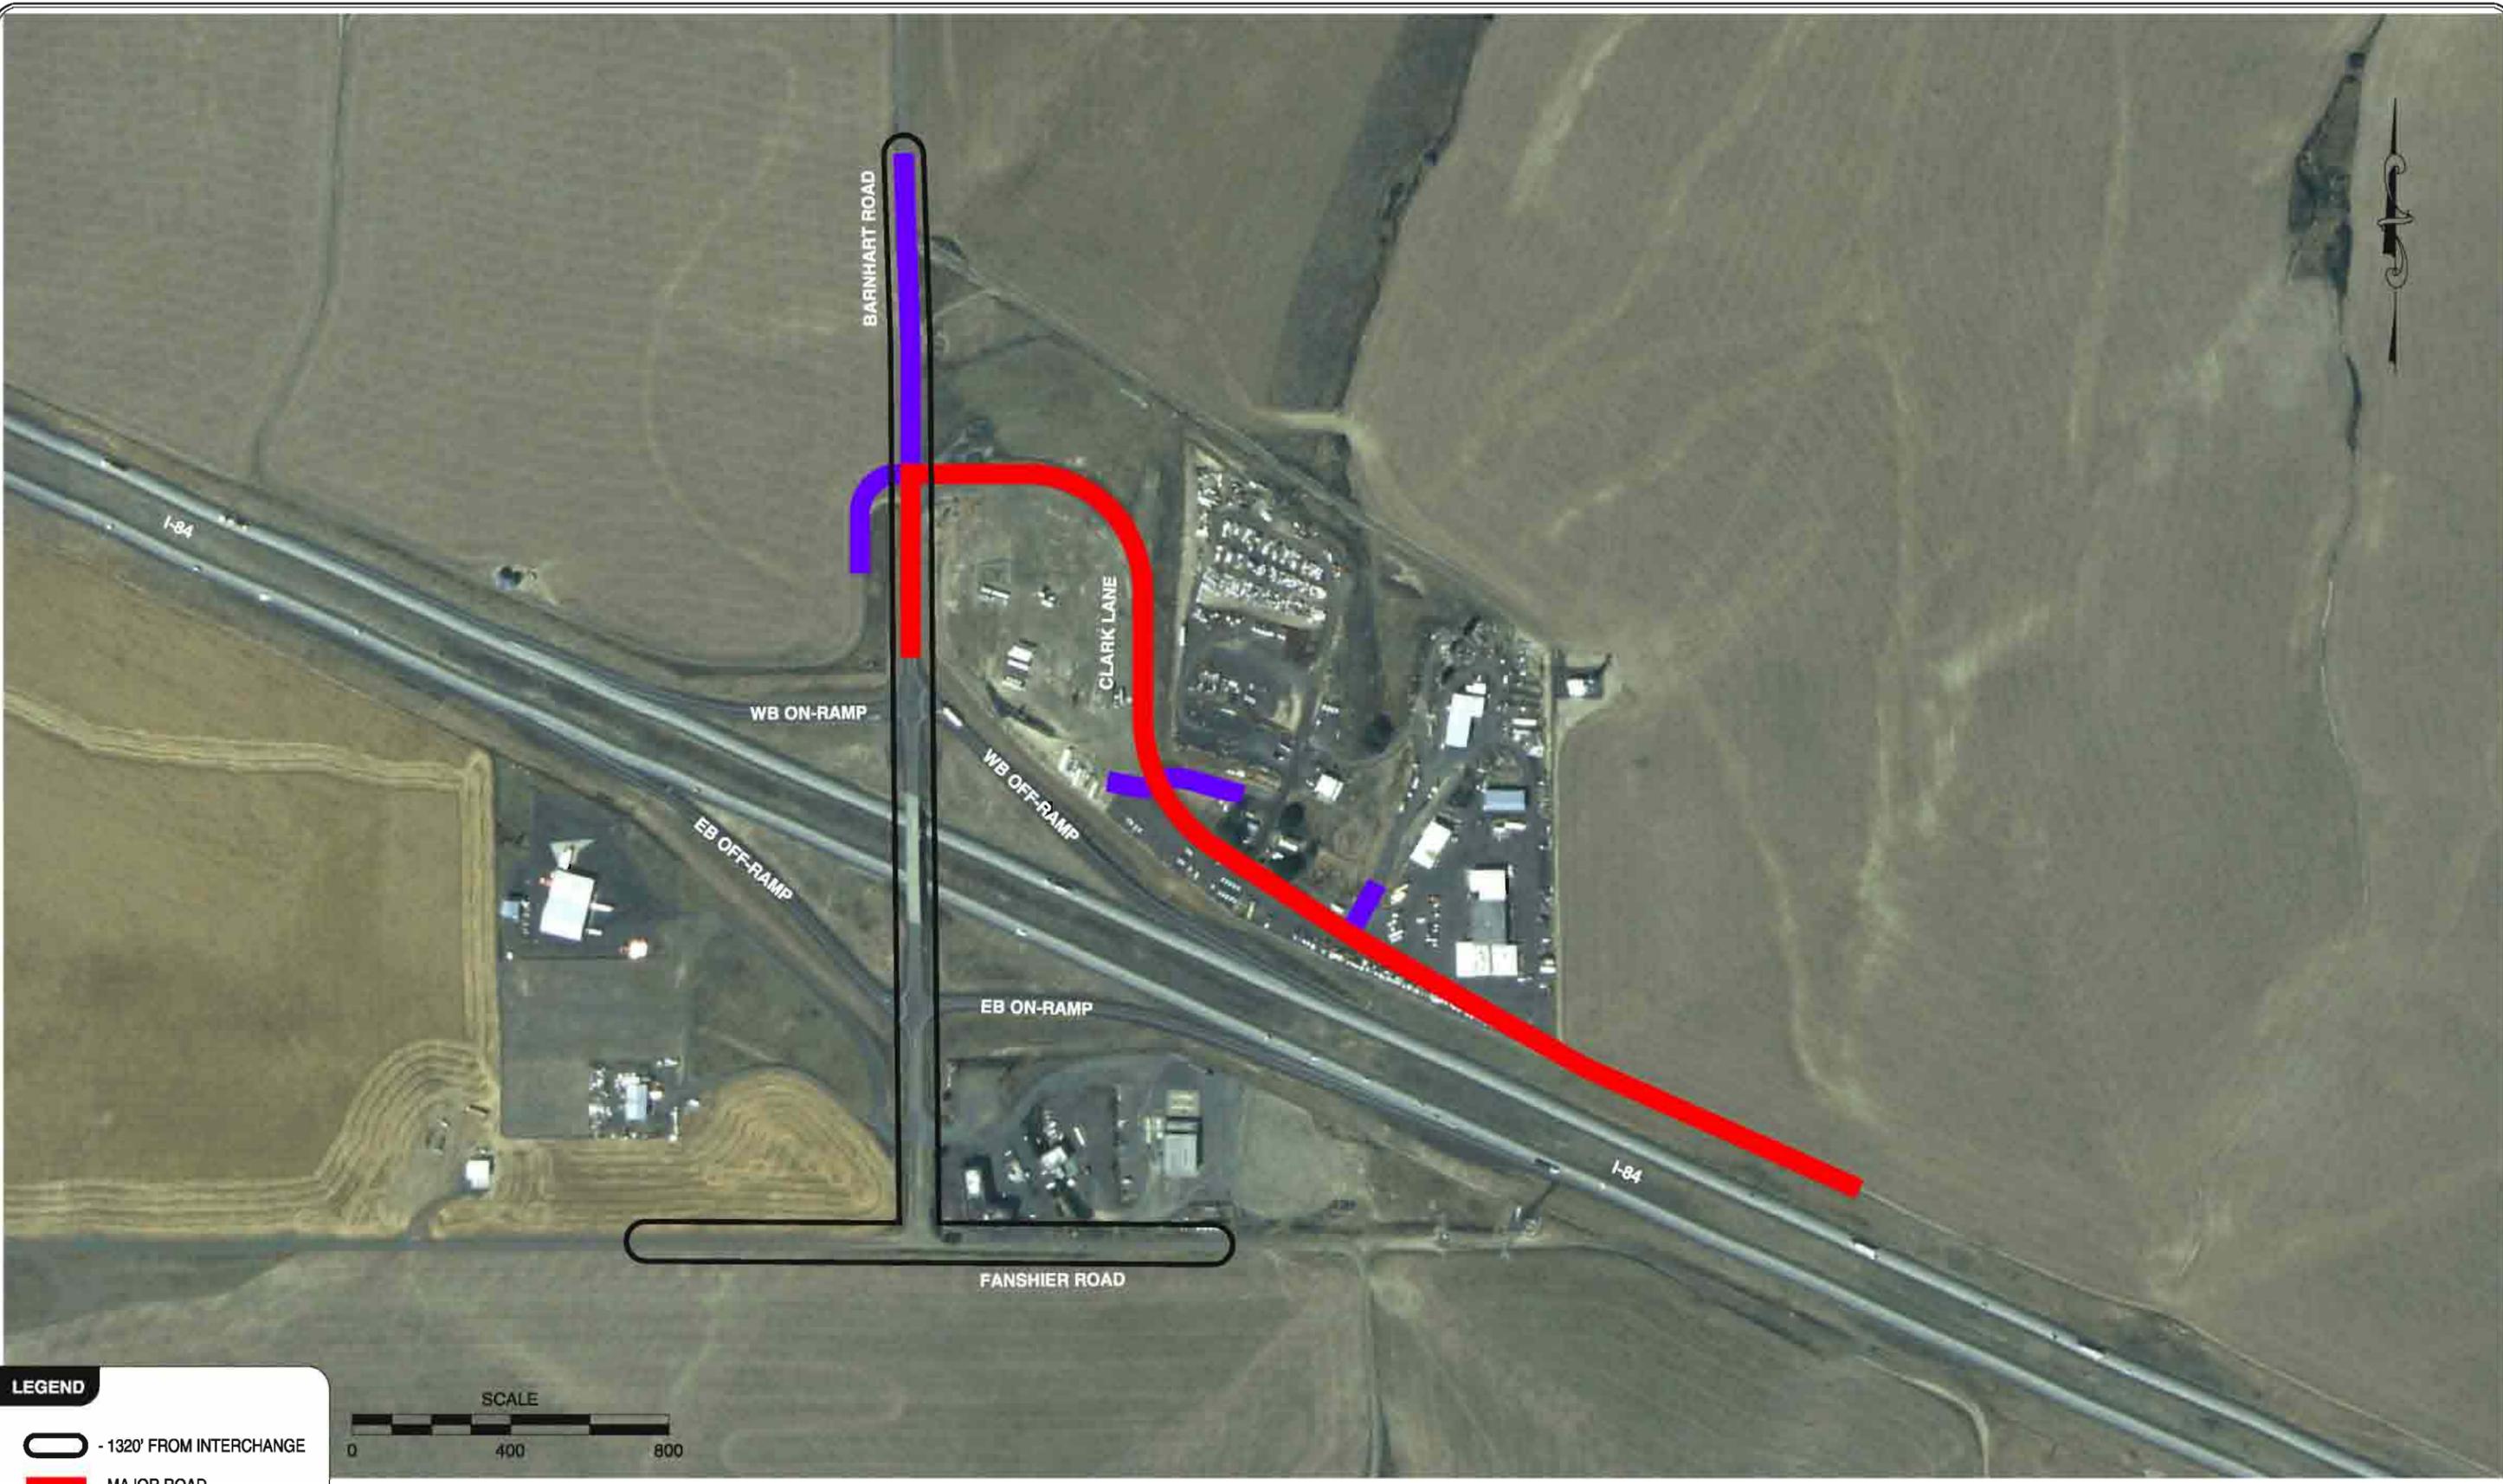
B shows the roadway alignment and access design for Concept #N1B. This concept is similar to Concept #N1A; however, instead of two “T” intersections being formed, the new connector and existing farm access create a four legged stop-controlled intersection with the existing Barnhart Road alignment. The new connector roadway again utilizes the existing Clark Lane alignment through the industrial property. The primary movement through the Barnhart Road/Connector roadway intersection remains Barnhart Road under this concept. .
